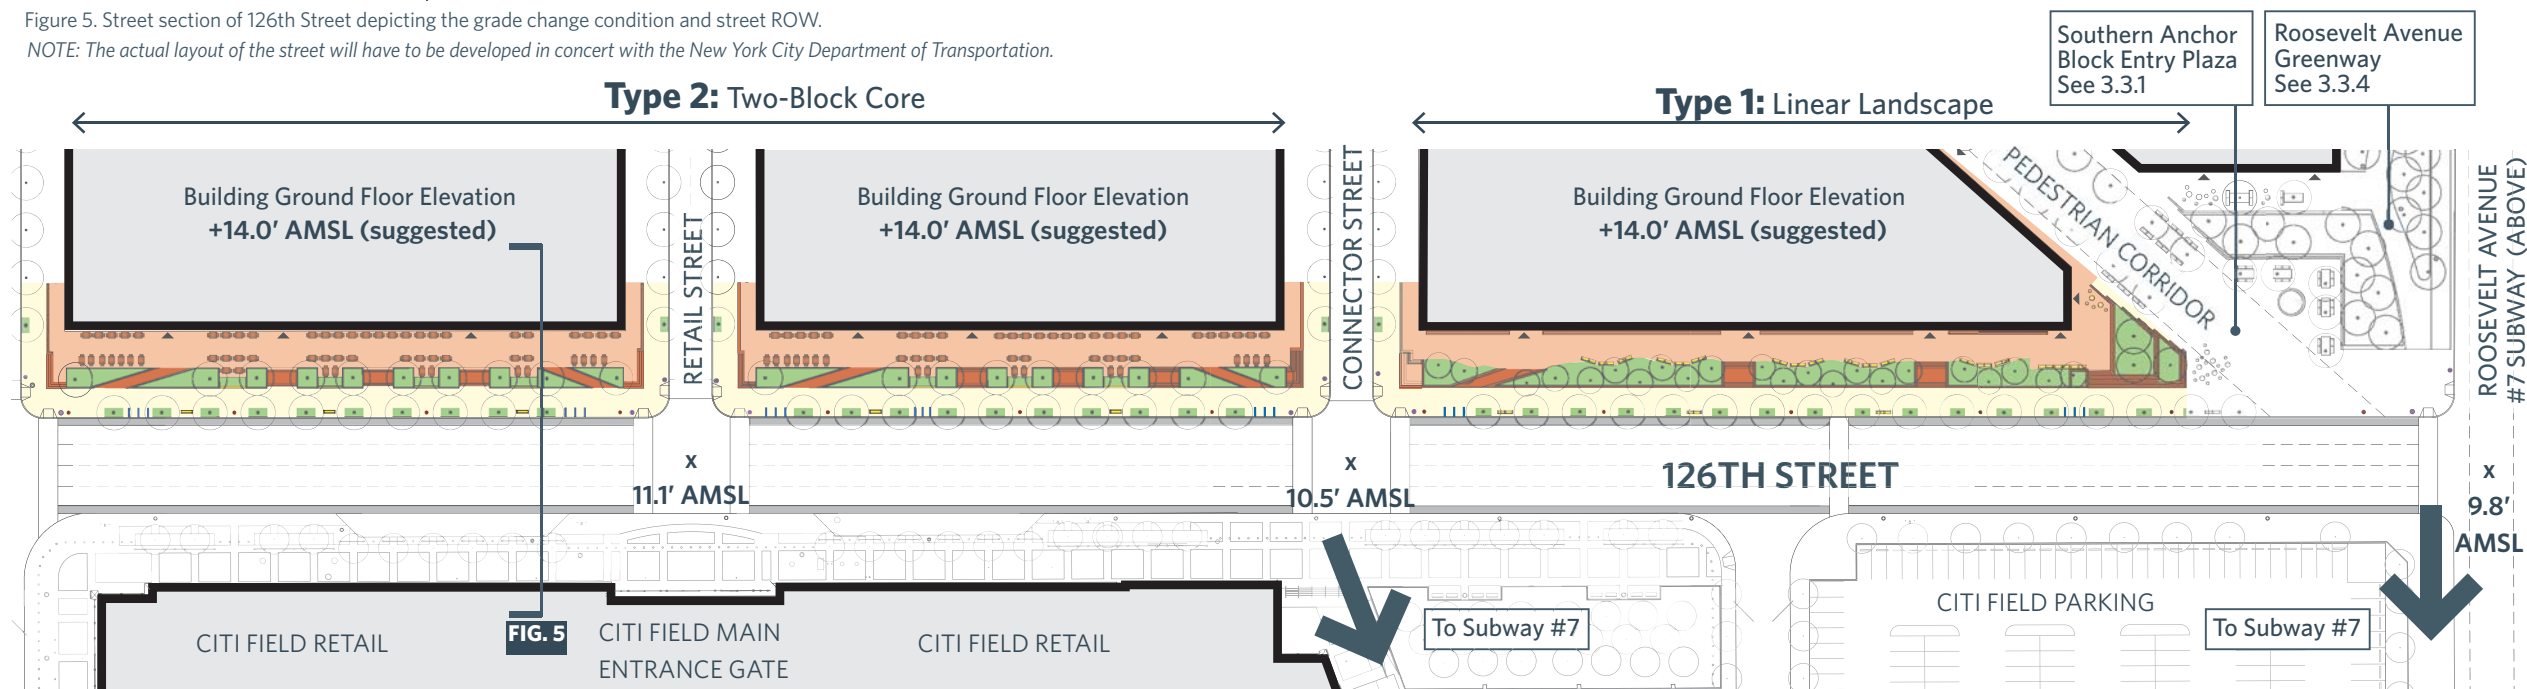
Street section of 126th Street depicting the grade change condition and street ROW.
